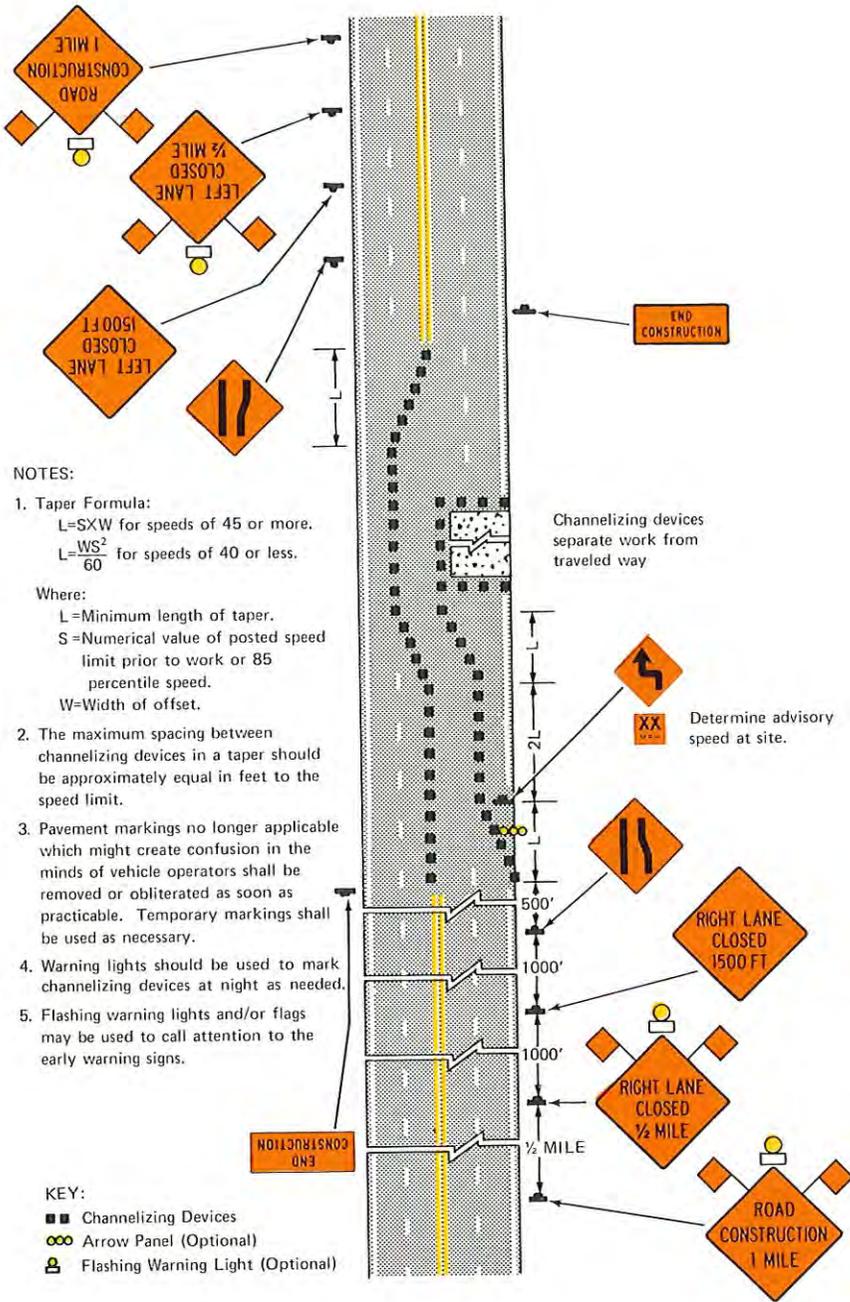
Typical application—4-lane undivided roadway, where half the roadway is closed.
